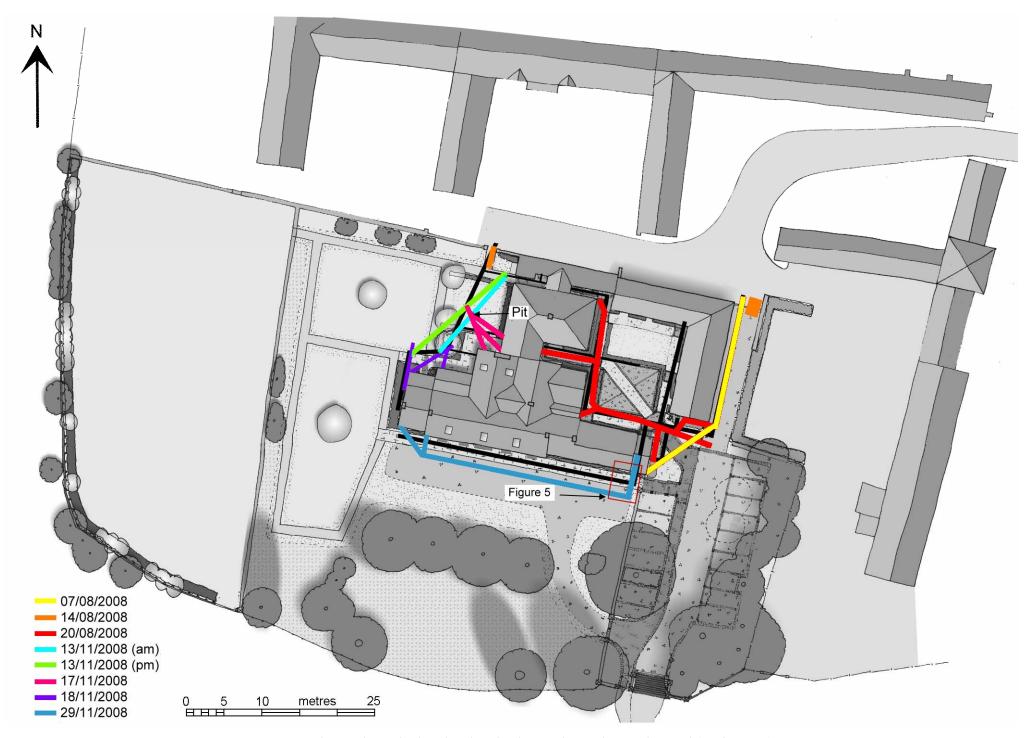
Observed trench plan showing the date each trench was observed (*scale 1:500*)
